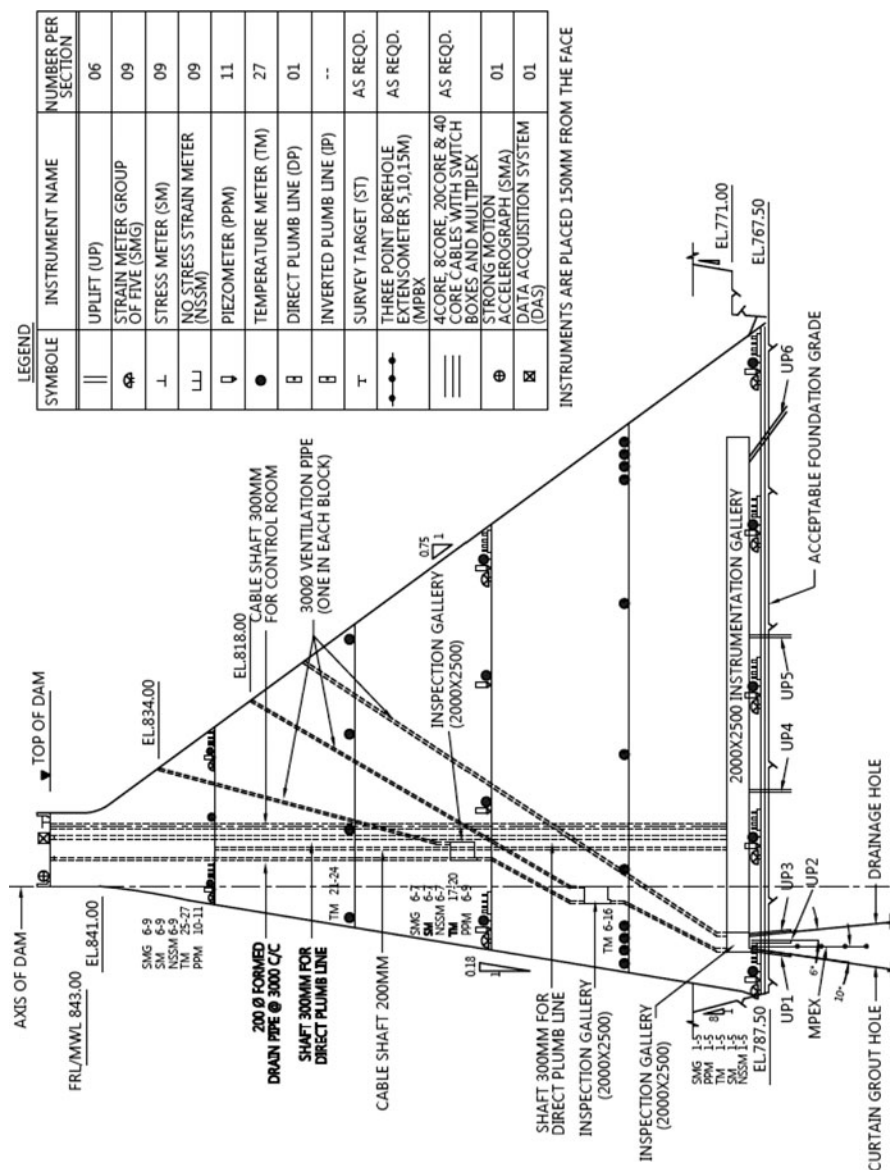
Concrete Dam instrumentation (non-over flow section) of 80 m high dam.
